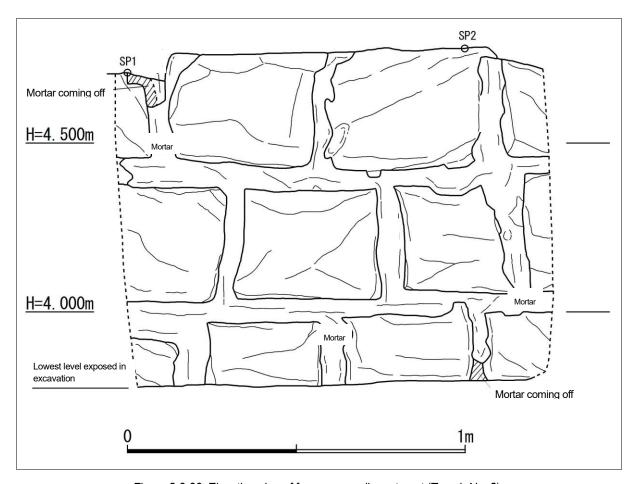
Elevation plan of former seawall revetment (Trench No. 2)
